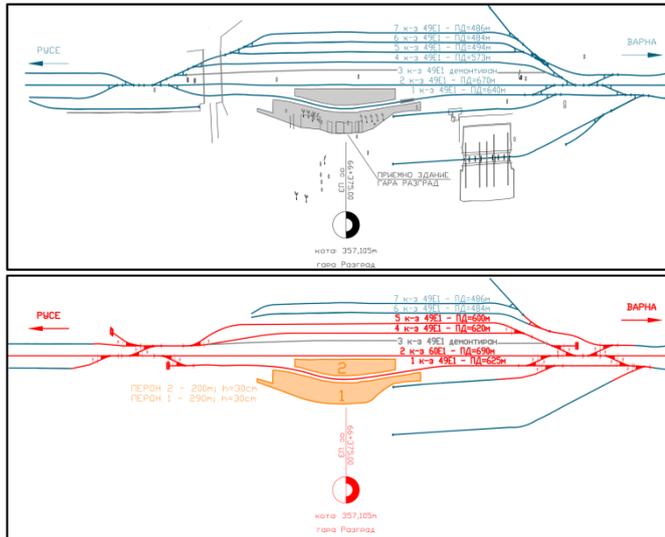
Schematic view of Razgrad station – Existing and proposed layout
